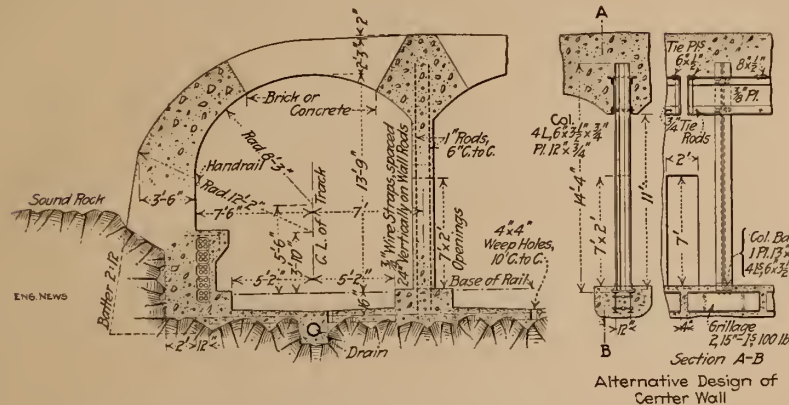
HEAVY STEEL SECTIONS IN CENTER WALL, LEXINGTON AVE. LINE AT 59TH ST.
